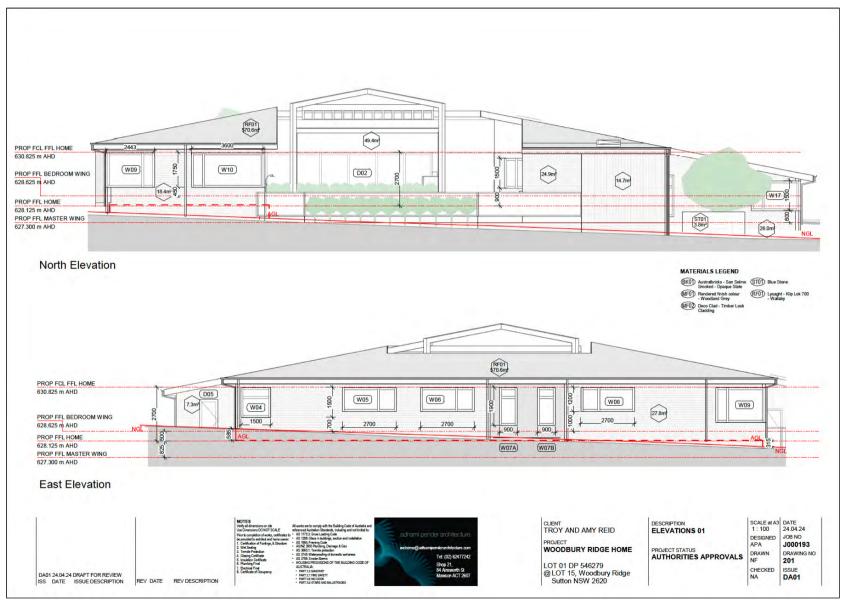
General Elevations (Adhami Pender Architects, 2024)
